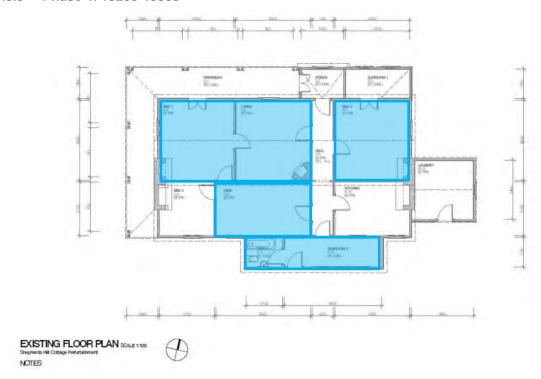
Existing floor plan of the cottage, showing the layout of the building and sections of the cottage that date from the 1920s and 1930s (indicated in blue). While Bed 1, Bed 2, the Lounge and Dining rooms date from the original construction period, the internal finishes were modified in the 1920s. The sunroom and bathroom were a later addition from the 1930s, as evidence in the external detailing to this section. (Source: Curran, drawing no. A100, revision A, 2 August 2017)
